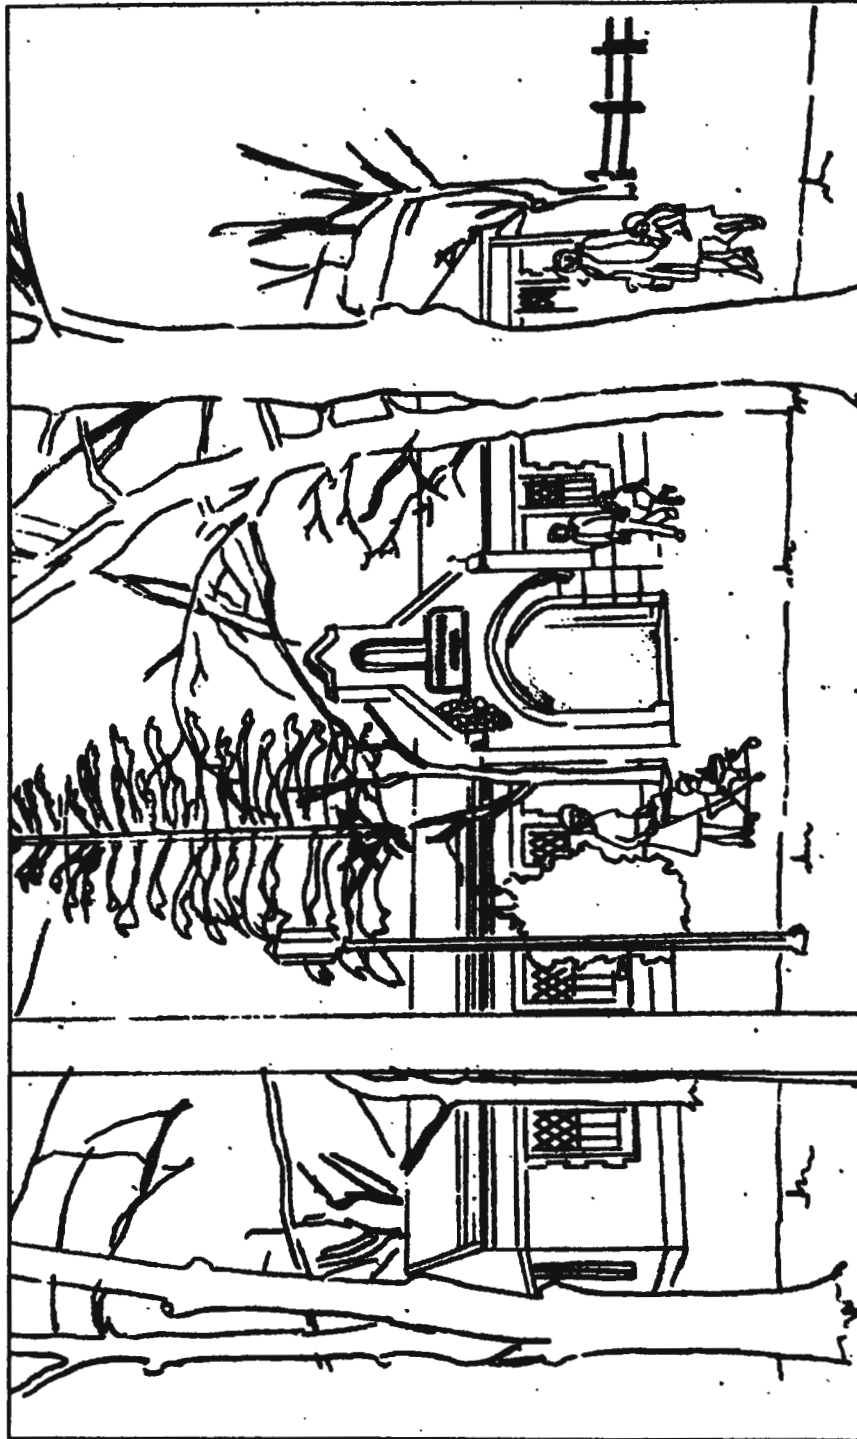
Sketch of Proposed Town Hall Facility
